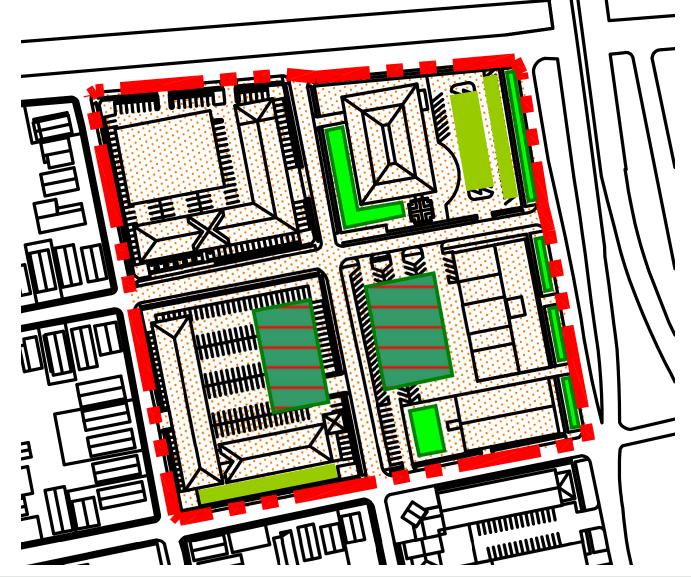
## EXHIBIT A STORMWATER MANAGEMENT PLAN
